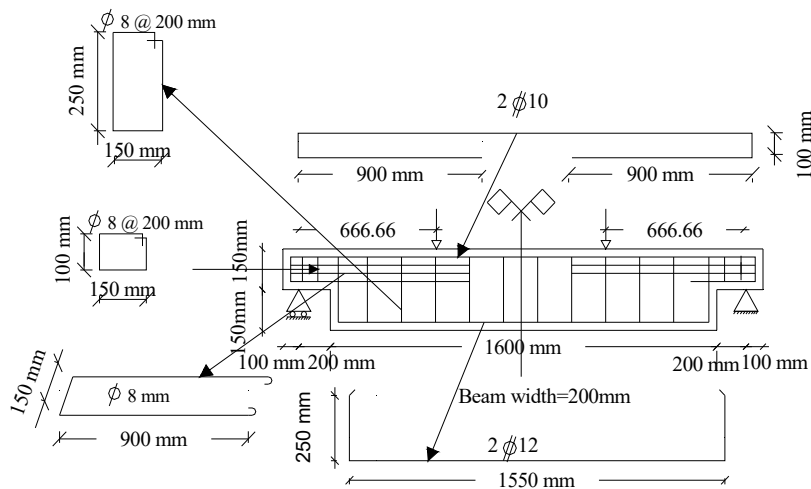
Dimensions and reinforcement details of modelled beam [13]
